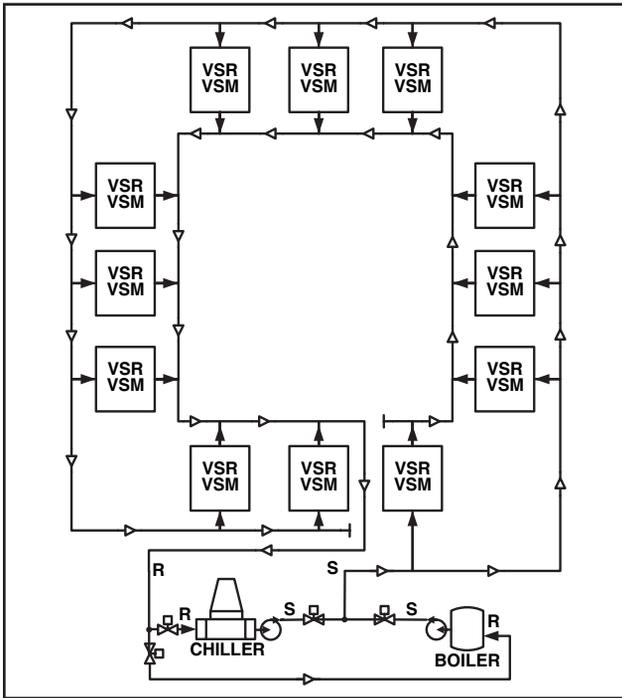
Piping Layout for a Horizontal 2-Pipe System with Reverse Return Piping
